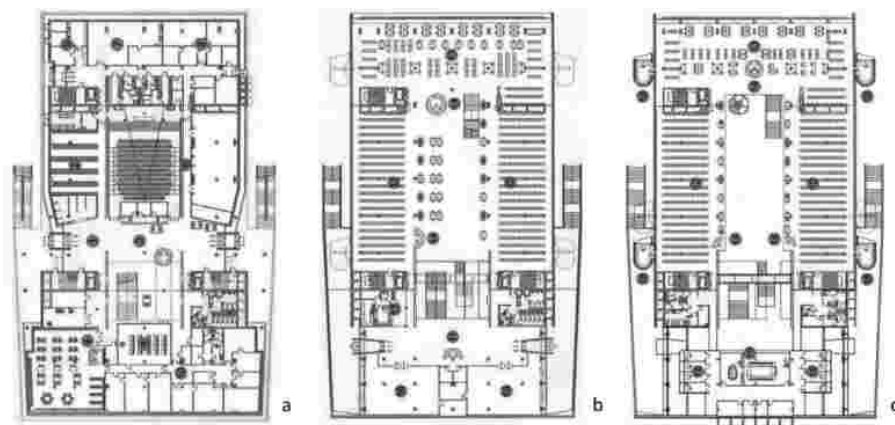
Architectural plans of the main library of the UG including ground floor (a), first floor (b), and second floor (c) (Source: Hamerska, 2021). The plans are oriented toward northeast at top.
